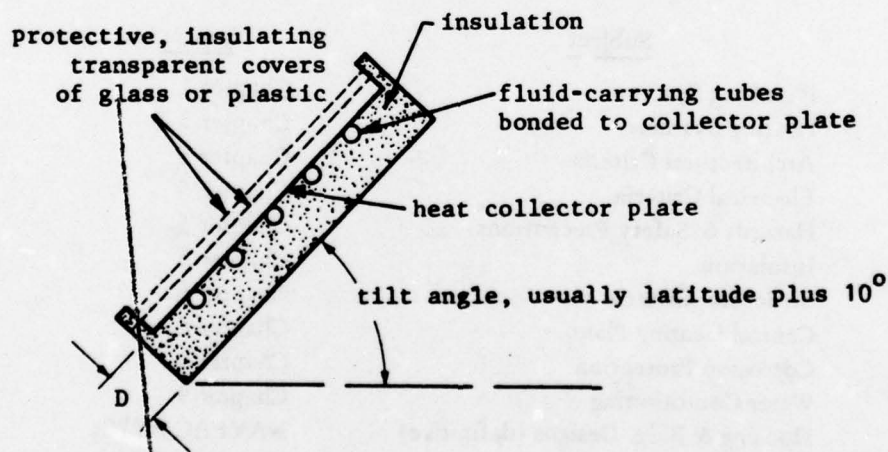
Schematic cross section of typical solar heat collector with heavy back insulation and two cover sheets.
